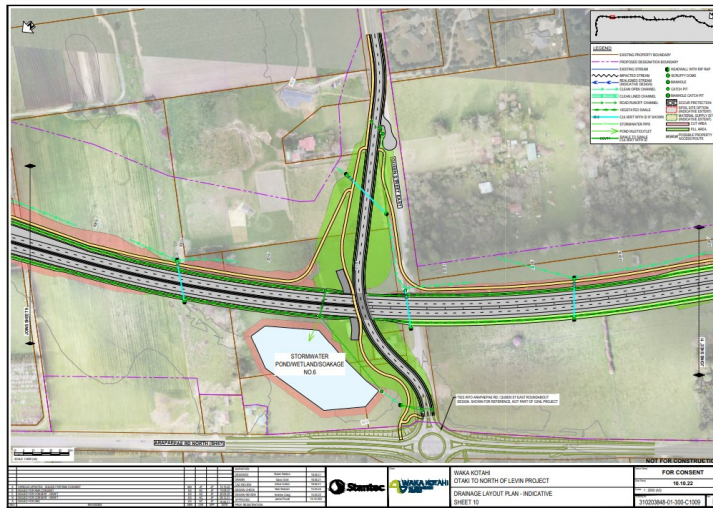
Drainage Layout in the vicinity of Queen Street East Over-pass (source: Vol. III Drainage Plans - Part 1)
